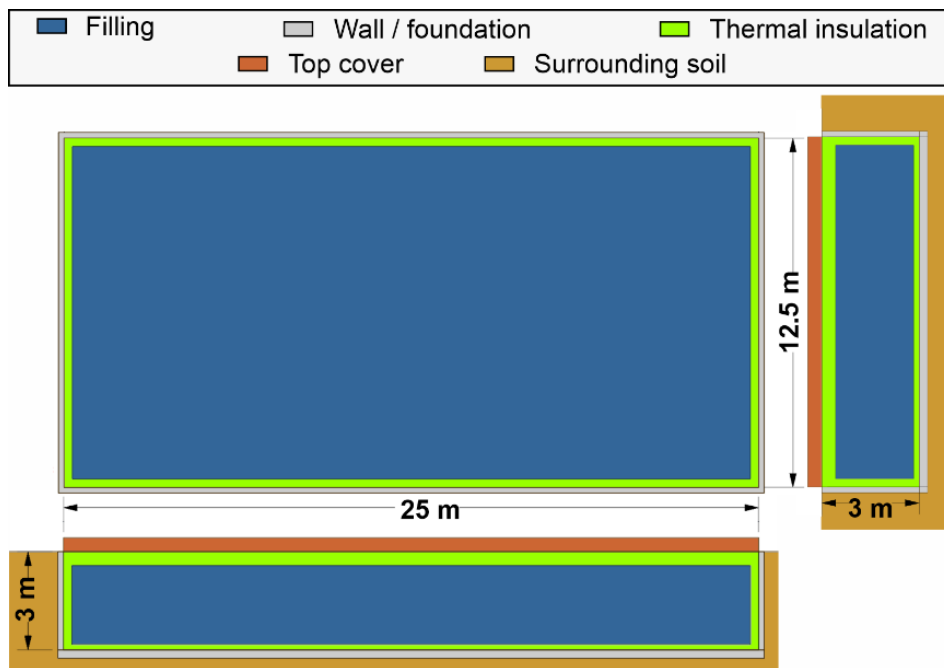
Top and side views of the sTES structure of the test study, with an illustration of filling, thermal insulation, walls and foundation, as well as external top covering and surrounding soil (suppressed in the top view).
